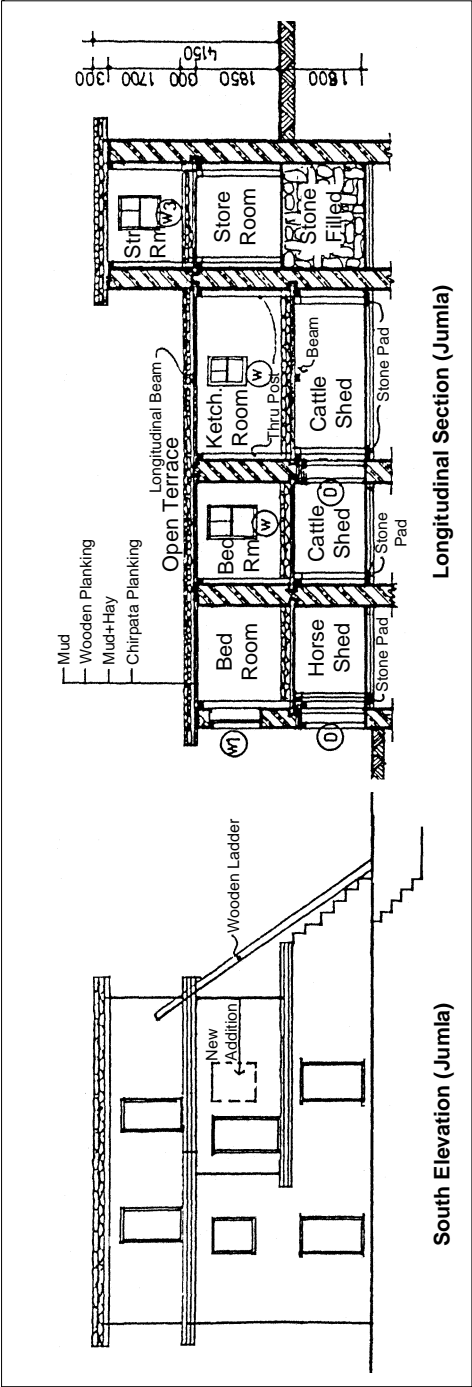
South Elevation and Longitudinal Section (Jumla)
